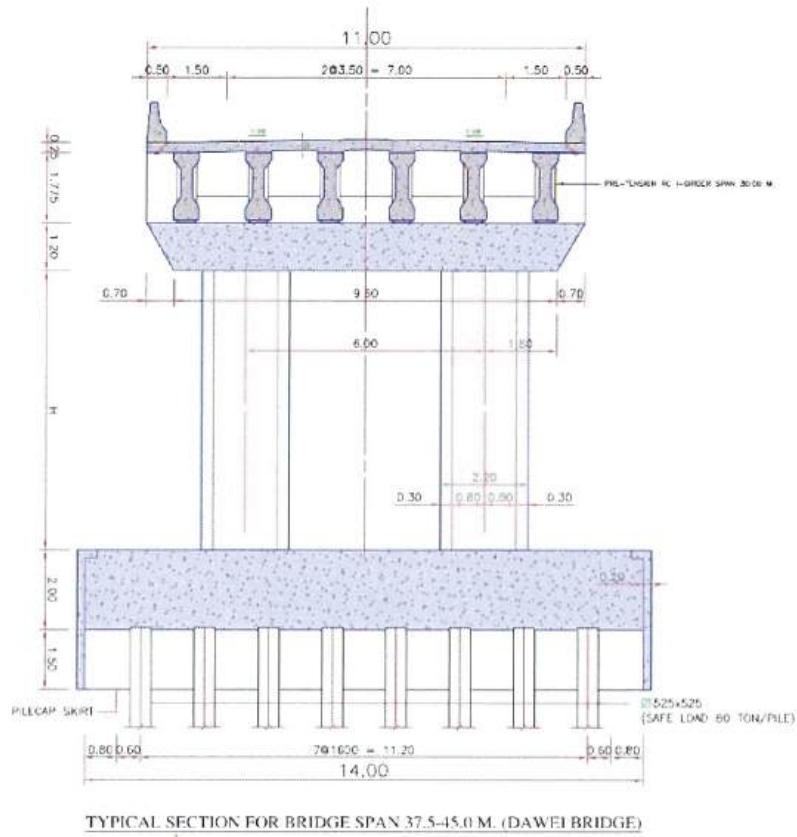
STRUCTURAL SCHEME AT DAWEI RIVER BRIDGE
